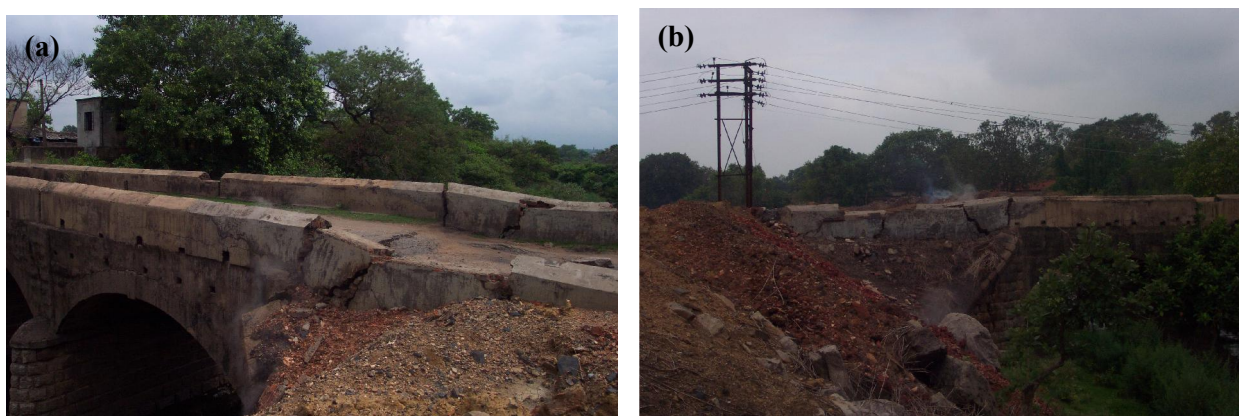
(a,b): Damaged foot bridge due to coal fire in Jayrampur area
